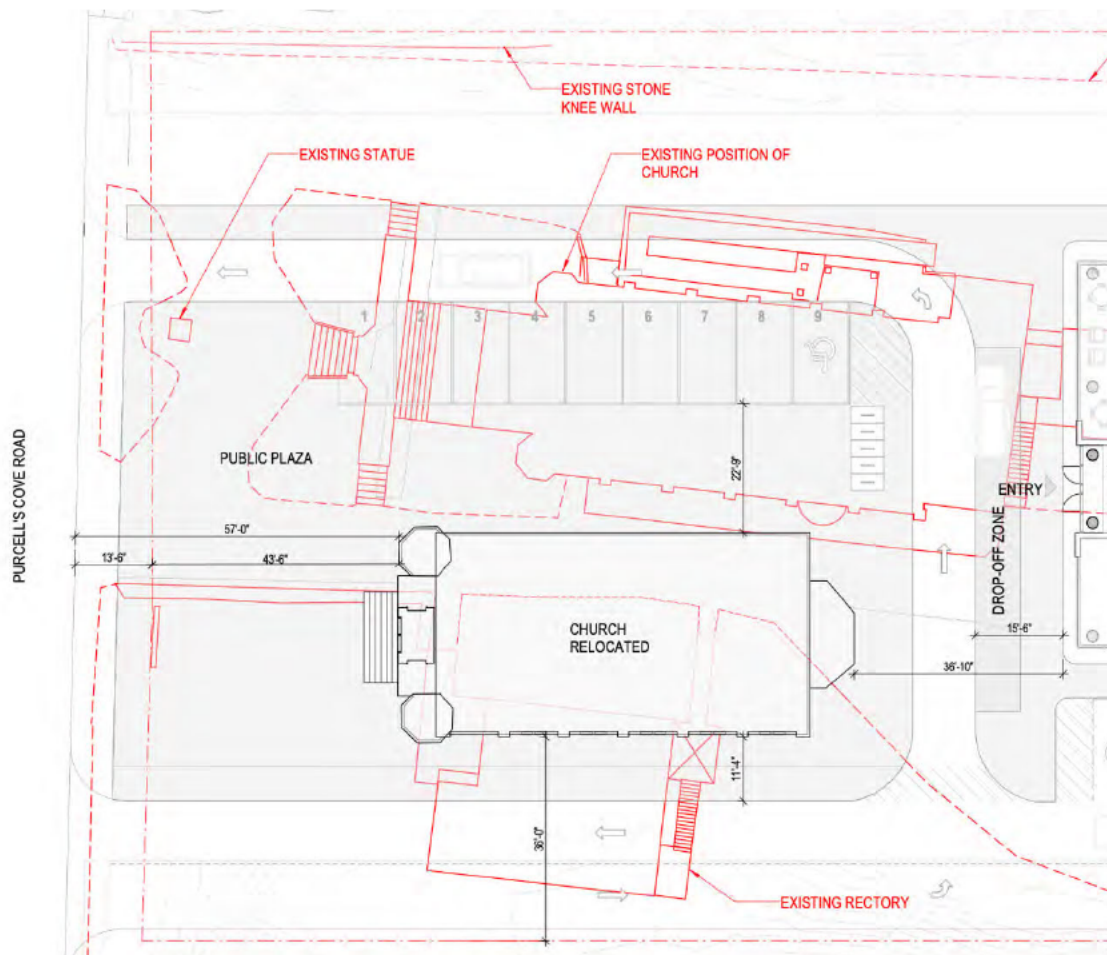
Development Proposal – Site Plan illustrating existing location of the former St. John the Baptist Church with its proposed new location. Source: FBM Architects
